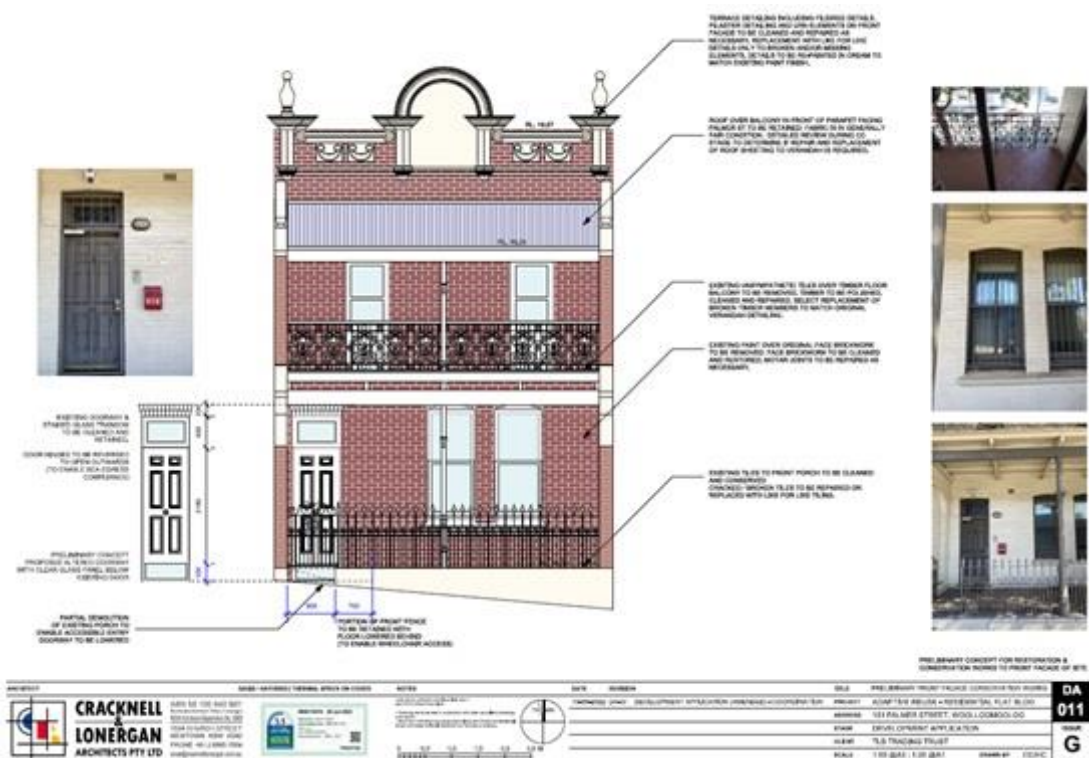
Proposed front (Palmer St) facade conservation works elevation
